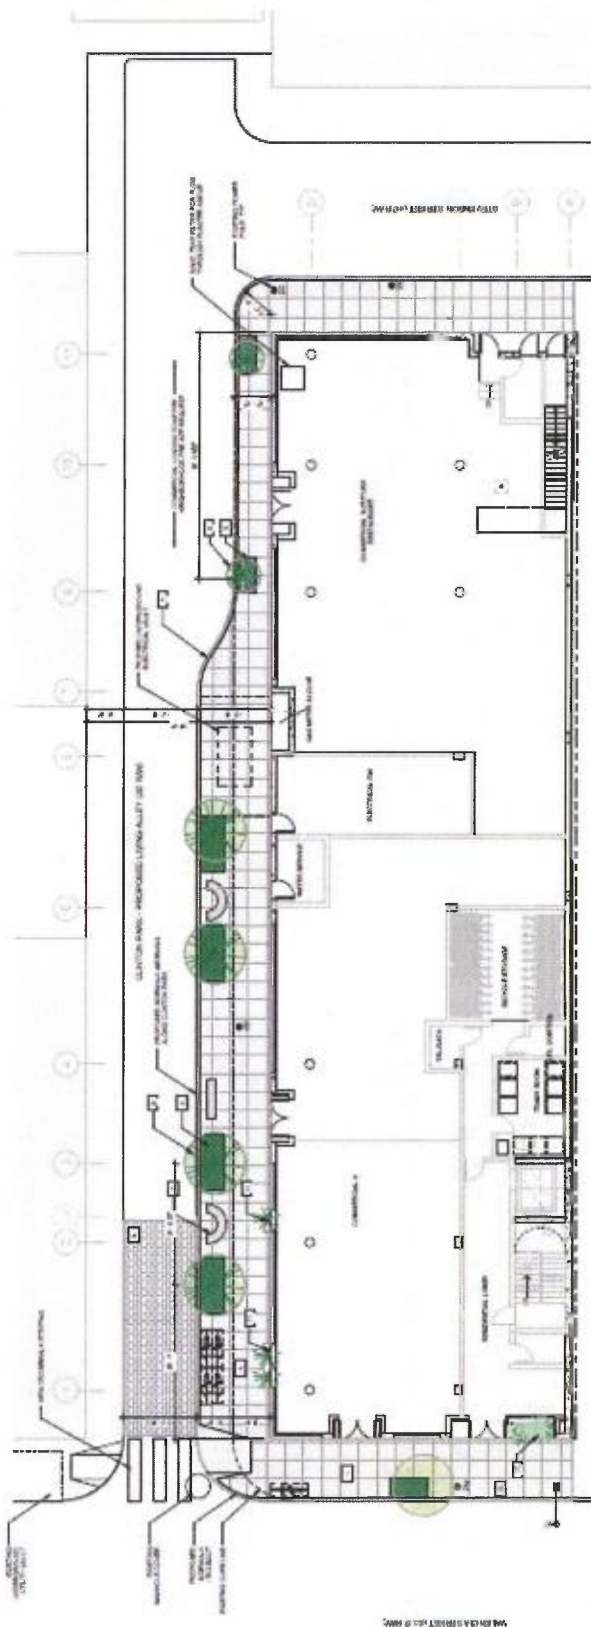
Ground floor plan (Source: Heller Manus Architects)
